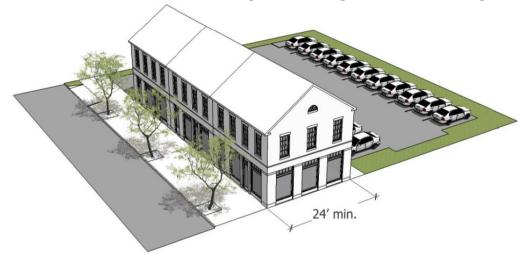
Parking Lot Masking with Liner Buildings
